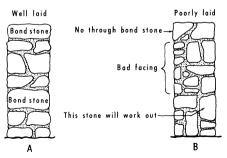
A, Well-laid stone wall with bondstones extending through the wall; B, weak, poorly laid wall without bondstones.
